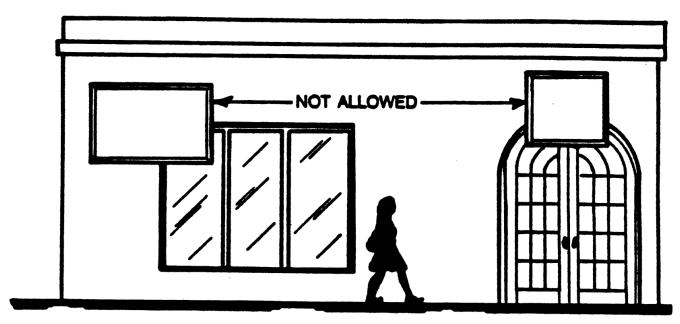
A Building Sign May Not Disrupt Architectural Features of the Building
